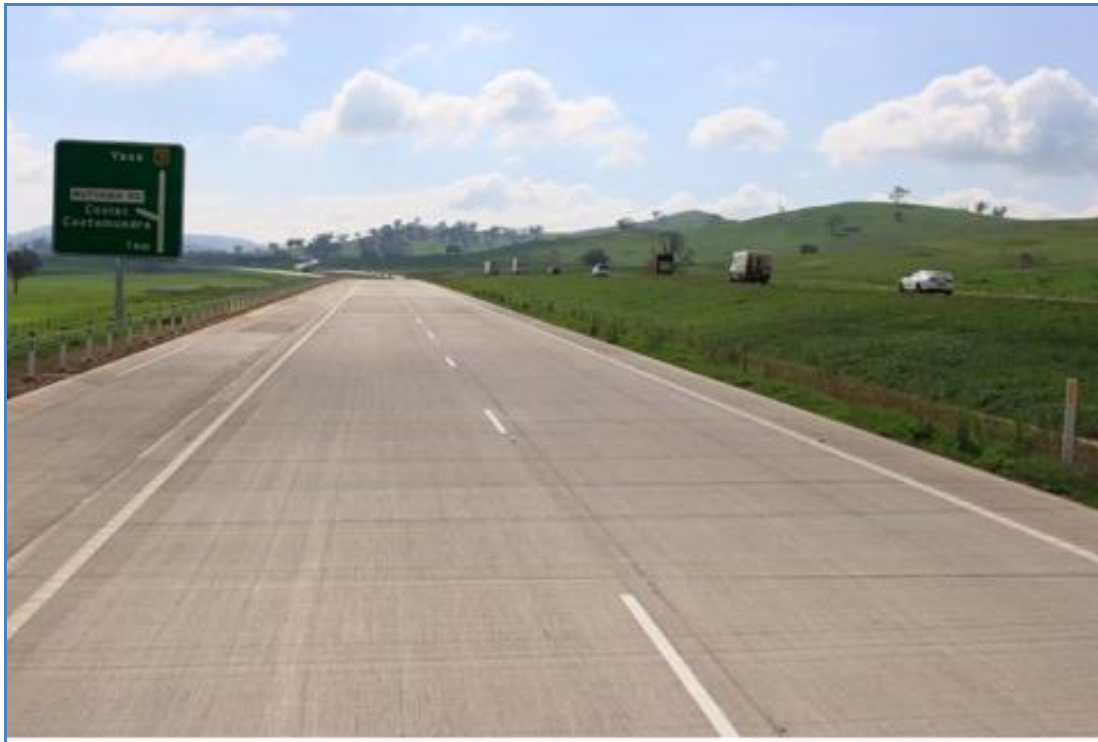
(a) A31 (Hume Highway) Southern NSW - Constructed structural concrete shoulder and widened truck lane
